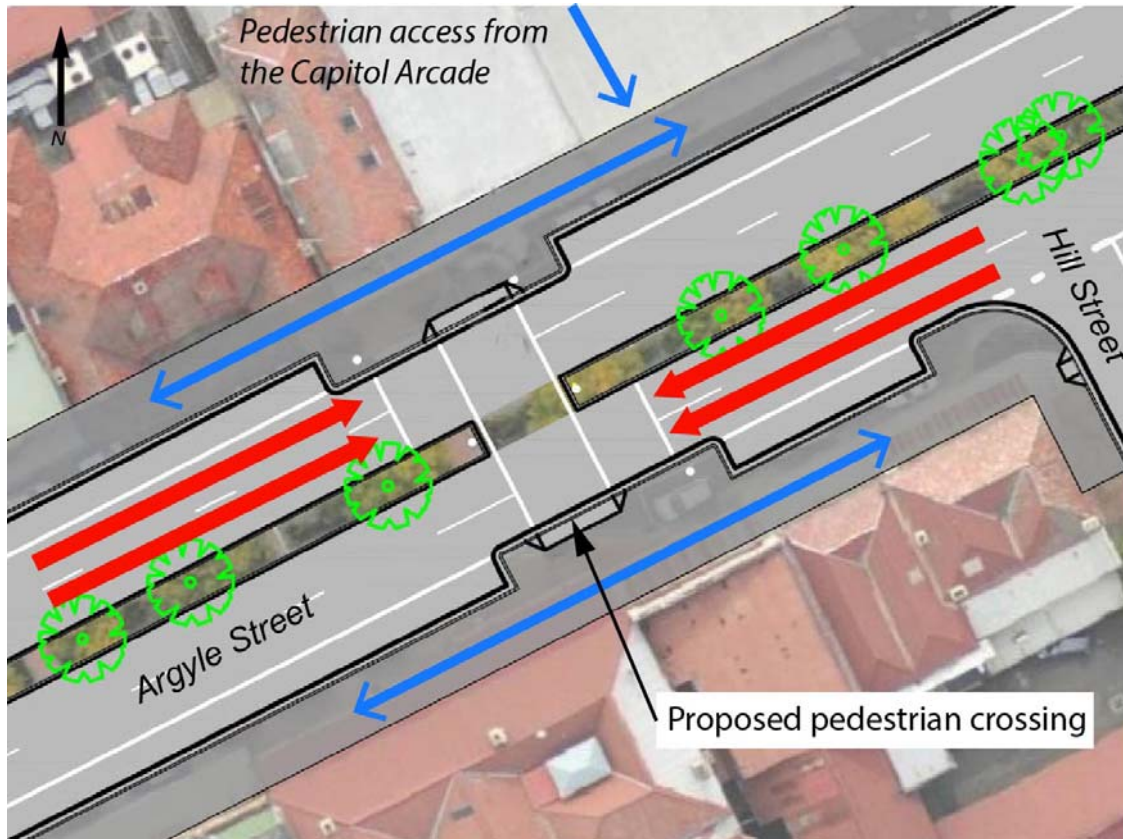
Mid Block pedestrian crossing between John Street and Hill Street
